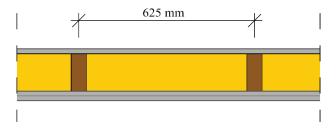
Cross section of the examined wooden frame wall (2 x 12.5 mm gypsum fiber board, 160 mm insulation material (Mineralwool, Straw with different densities), $2 \times 10 \text{ mm}$ gypsum fiber board)
